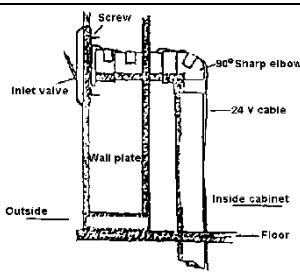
Installation of inlet valves in existing homes. Mount the backing plate inside the wall (from the outside) and fix the inlet valve.
